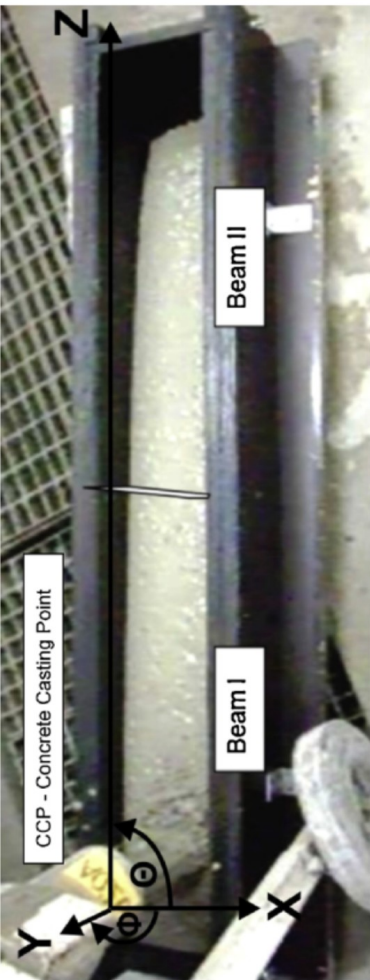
Methodology of casting concrete mix in case of SFRSCC 150 mm × 150 mm × 1200 mm beam.
